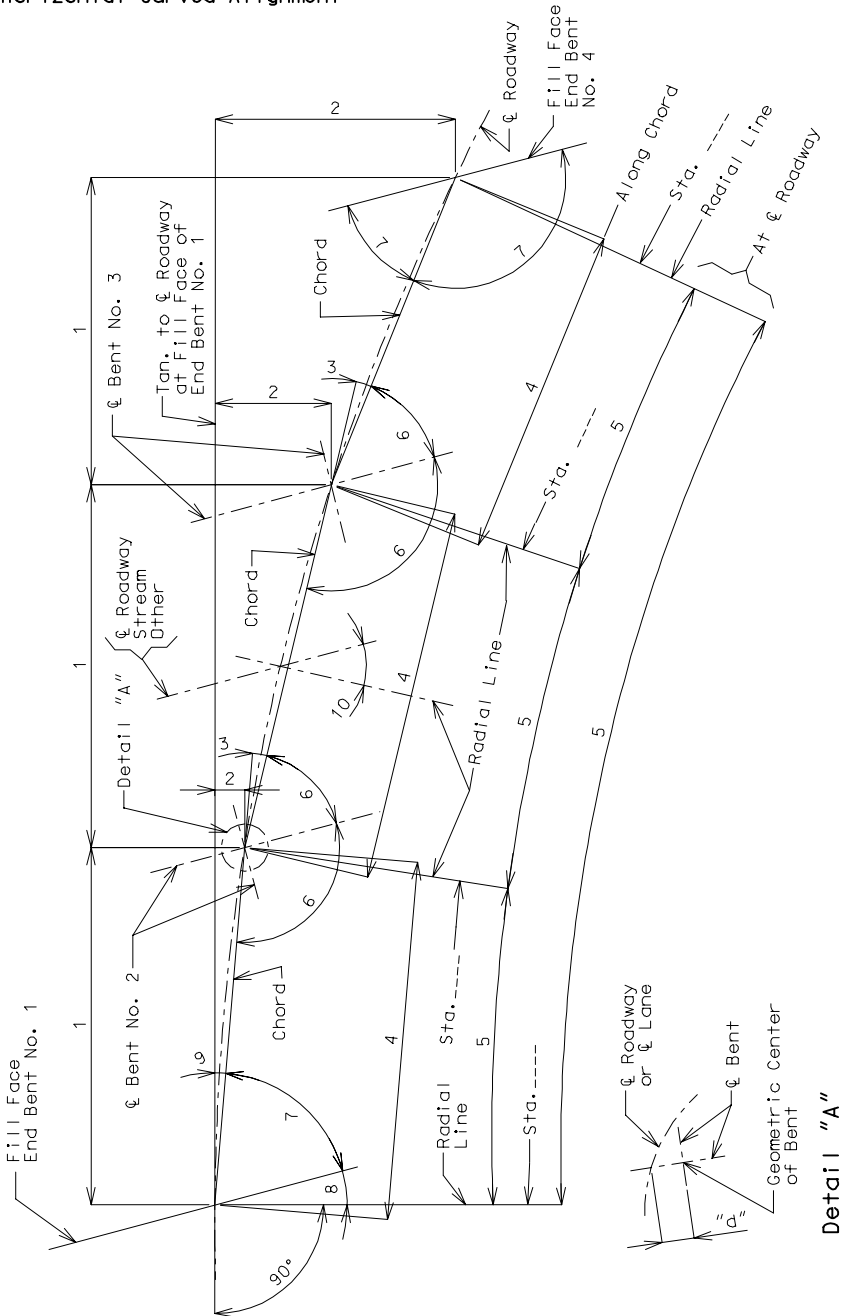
Single Lane Structure Tied at Fill Face of End Bent
